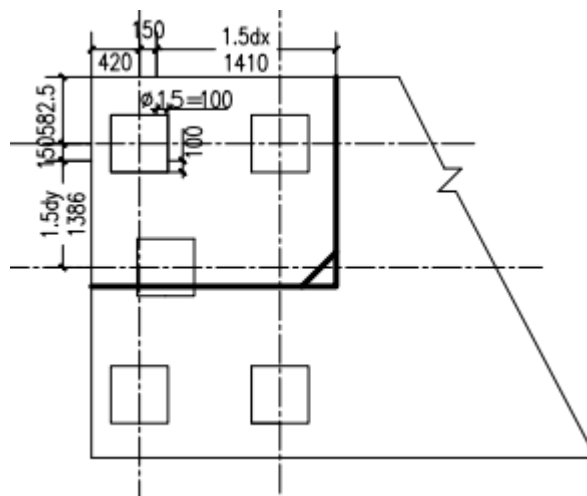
Critical planes for punching shear of piles in pile cap
